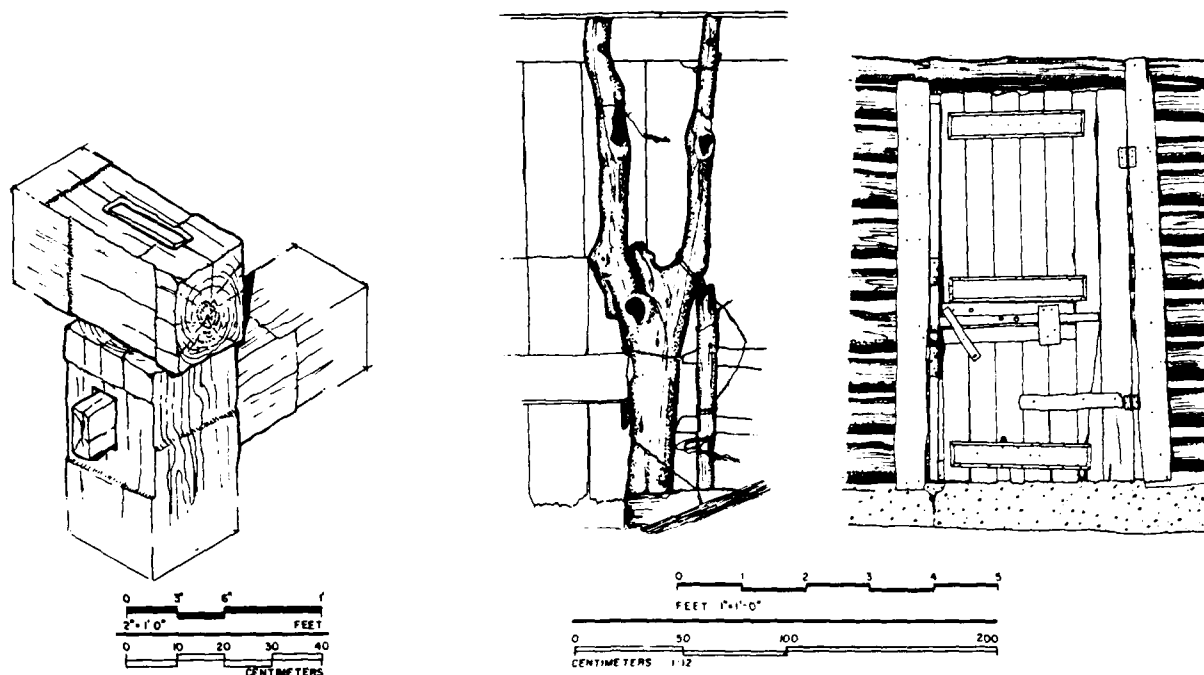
Construction details of the north granary (left; no. 11 from Figure 8-3), the double crib log barn (center; 9), and the small log barn (right; 10). Mortise and tenon beams from an old building were reused to construct the stabling wings of the double crib log barn (HABS drawings by Will E. Alexander for Environmental Consultants, Inc. 1982-1984).
